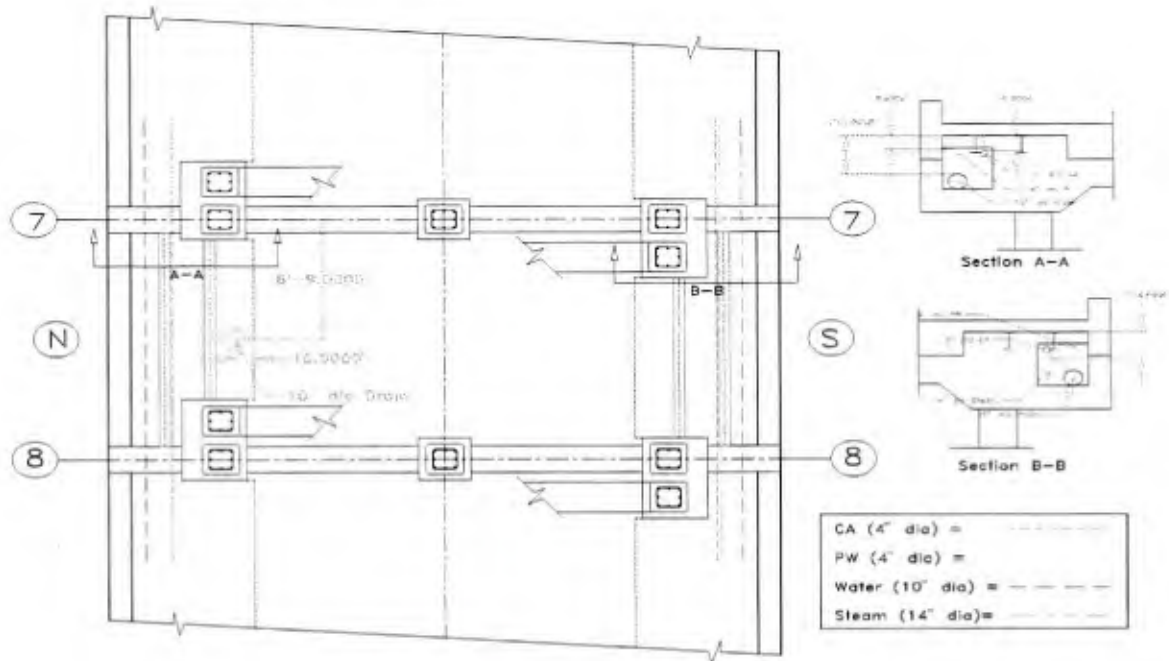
Nominal locations of Structural I-sections supporting 8-inch deck section.
